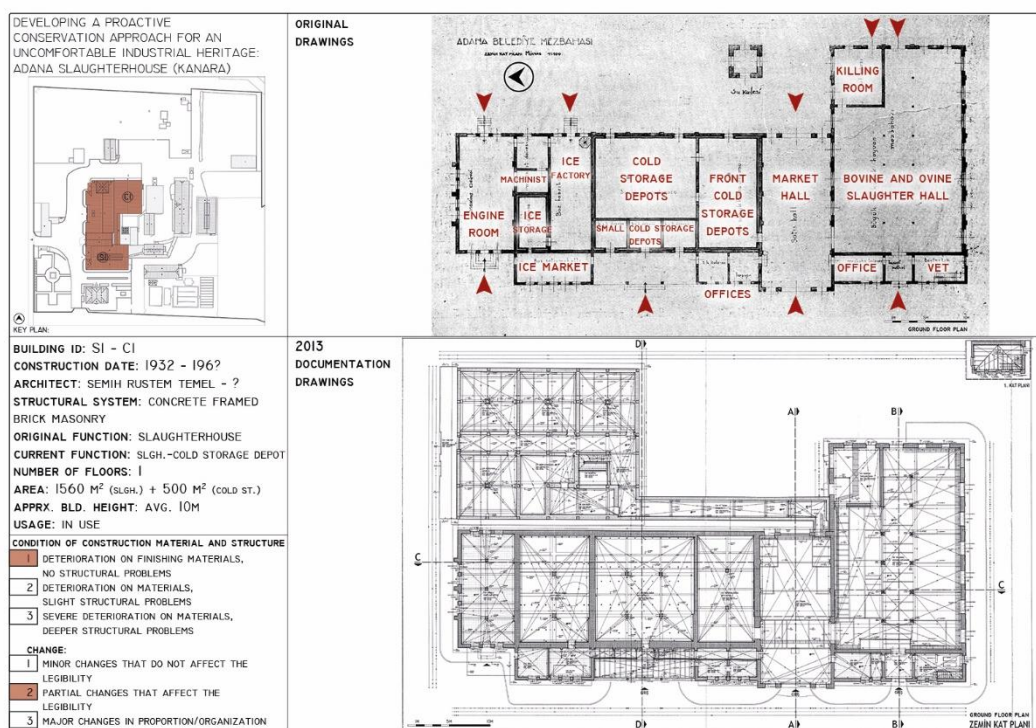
Inventory sheet of the slaughterhouse building showing the original plan and the current situation (Appendix-F)
